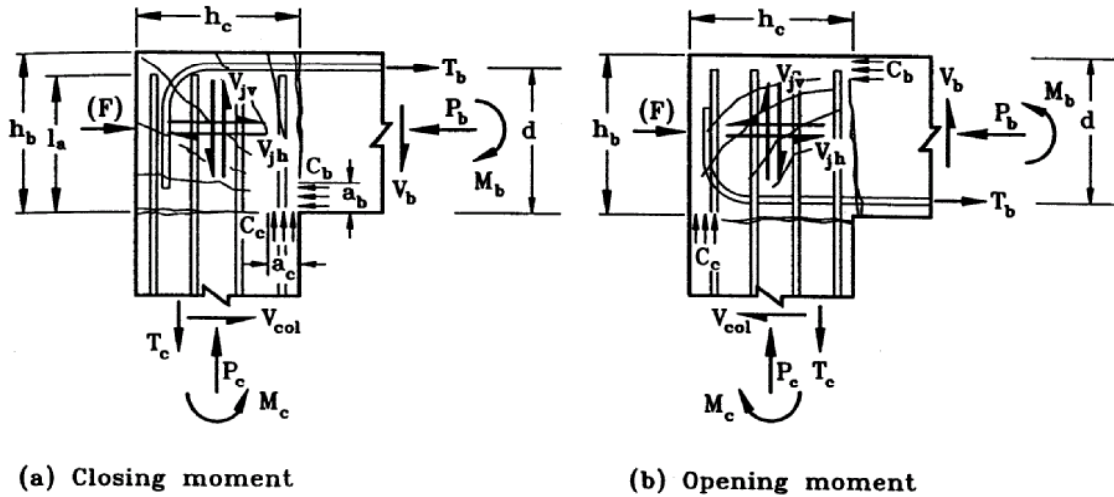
Forces Acting on a Knee Joint (Adapted from Priestley et al., 1996)
